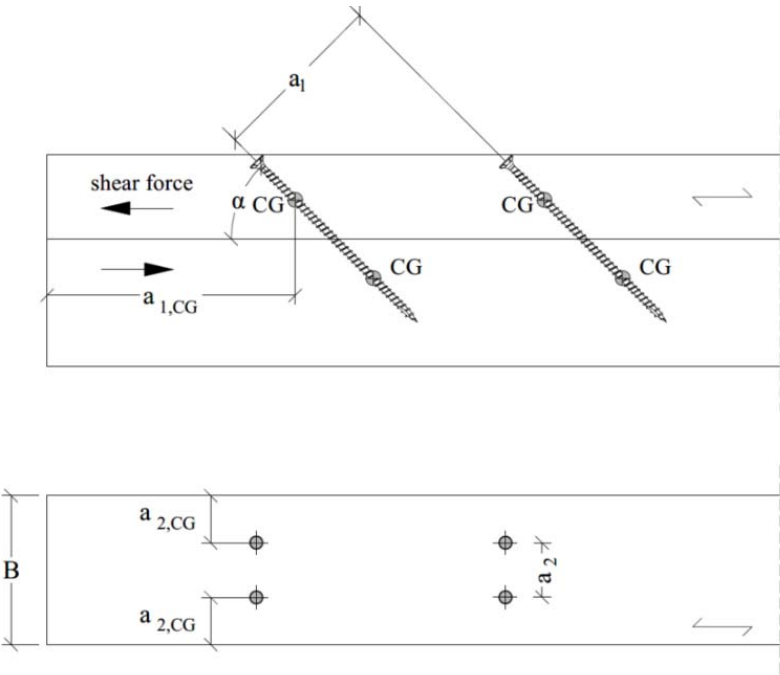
END AND EDGE DISTANCE AND SPACING FOR AXIALLY LOADED SCREWS AT AN ANGLE TO THE GRAIN – SINGLE CONFIGURATION
